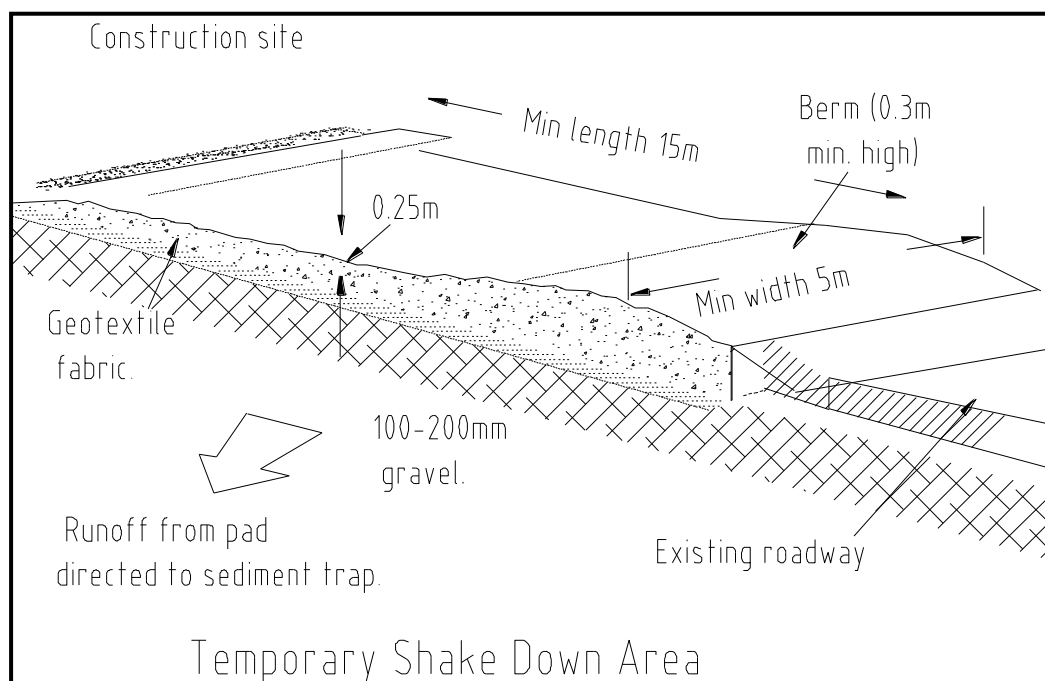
Typical Construction Entry/Exit Shake Down area
